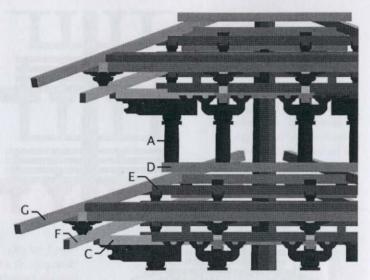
Component relationships among columns (A), upper tie beams (C), lower tie beams (D), the wall box (E), lower roof rafters (F), and upper roof rafters (G).
